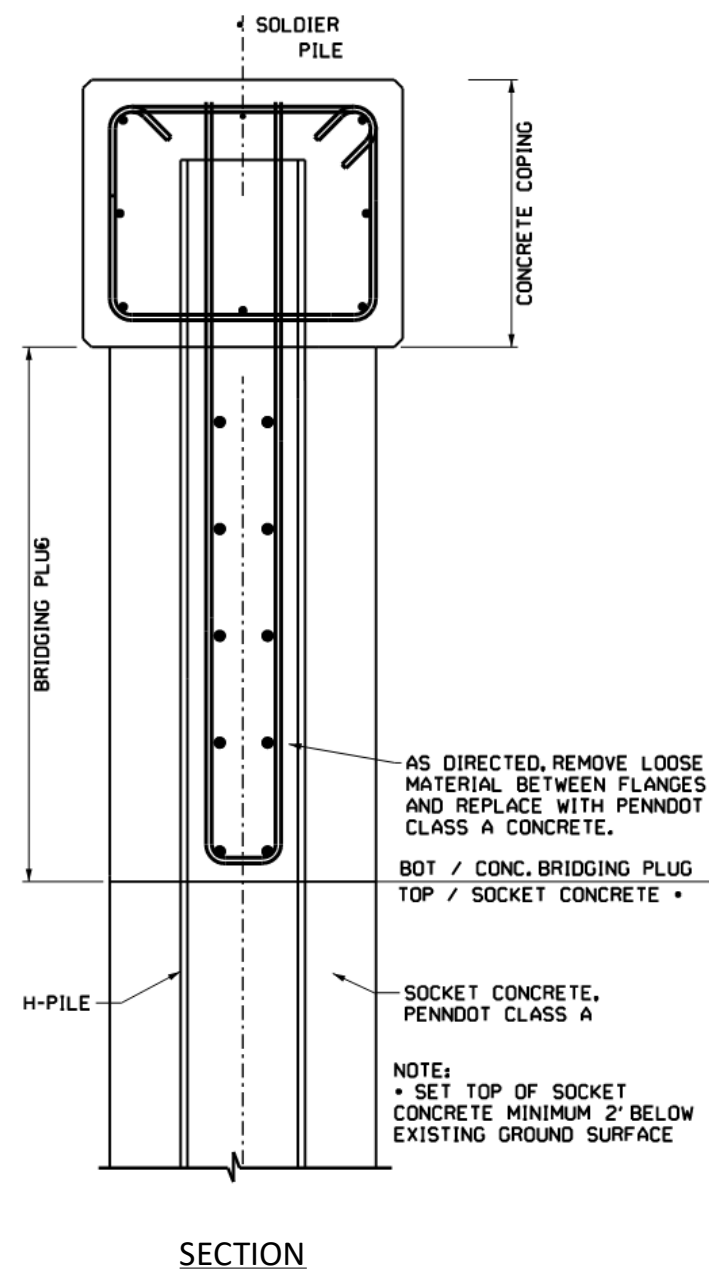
Typical Detail, Anchored Walls (Sheet 9 of 9)
